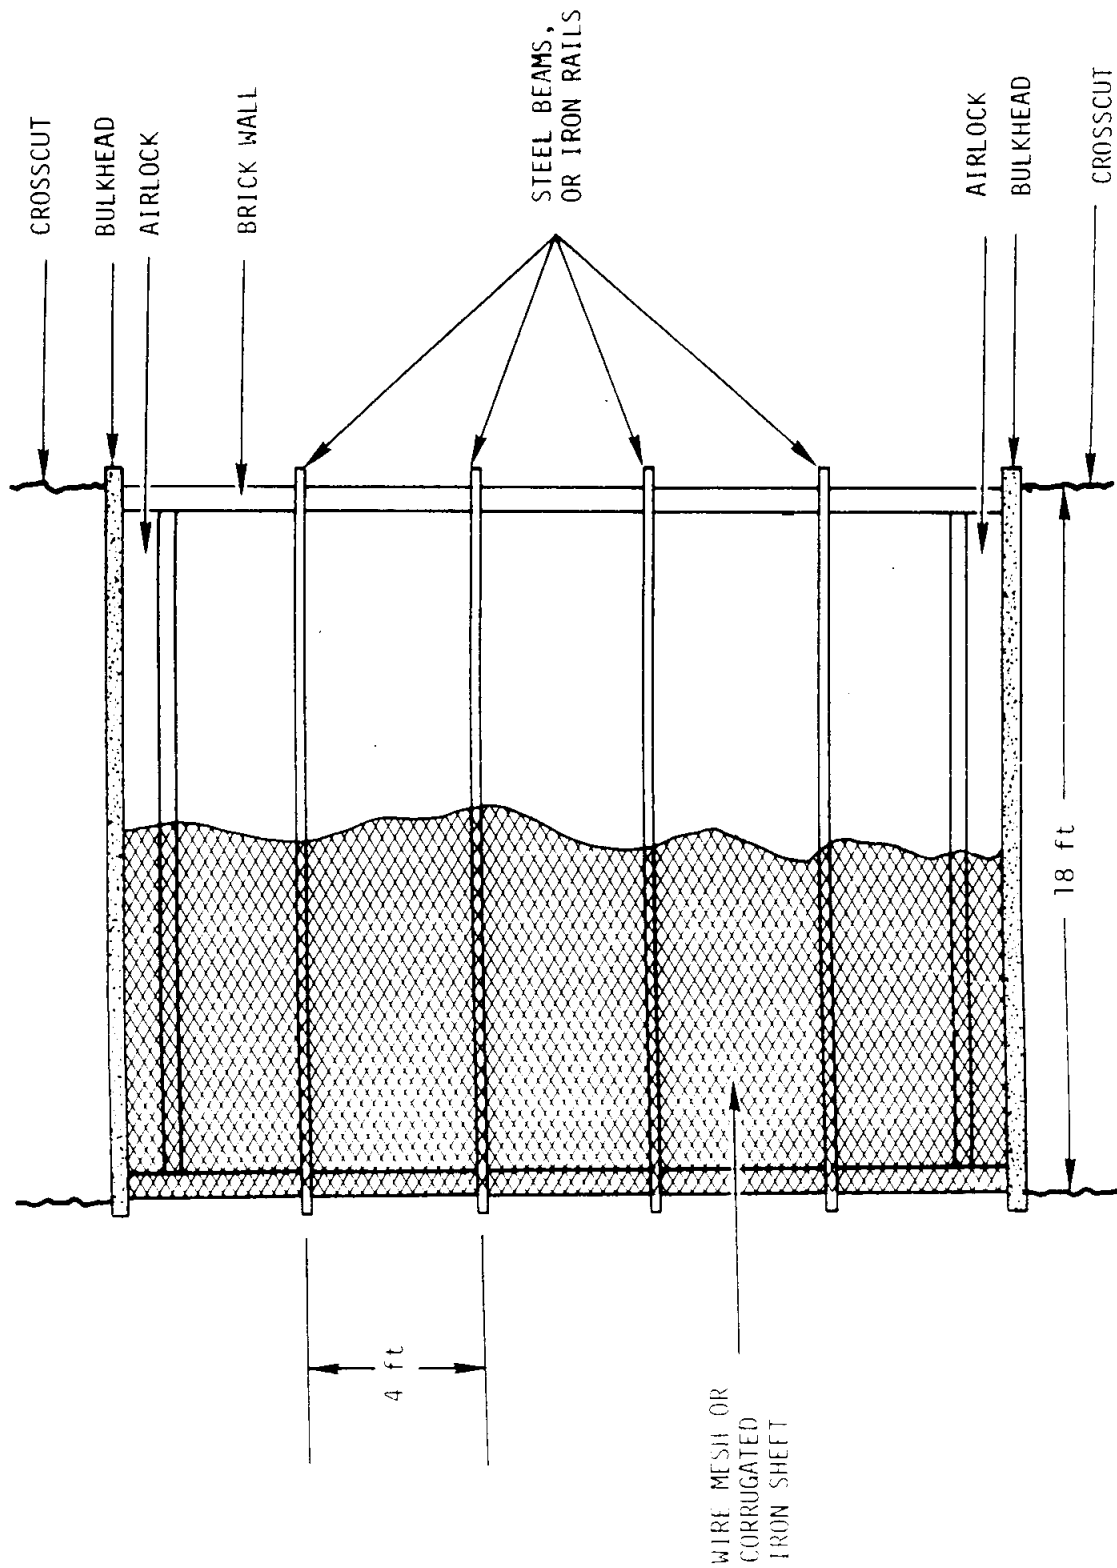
Support plan for rescue chamber using steel beams or rails with wire mesh or corrugated iron sheet.
